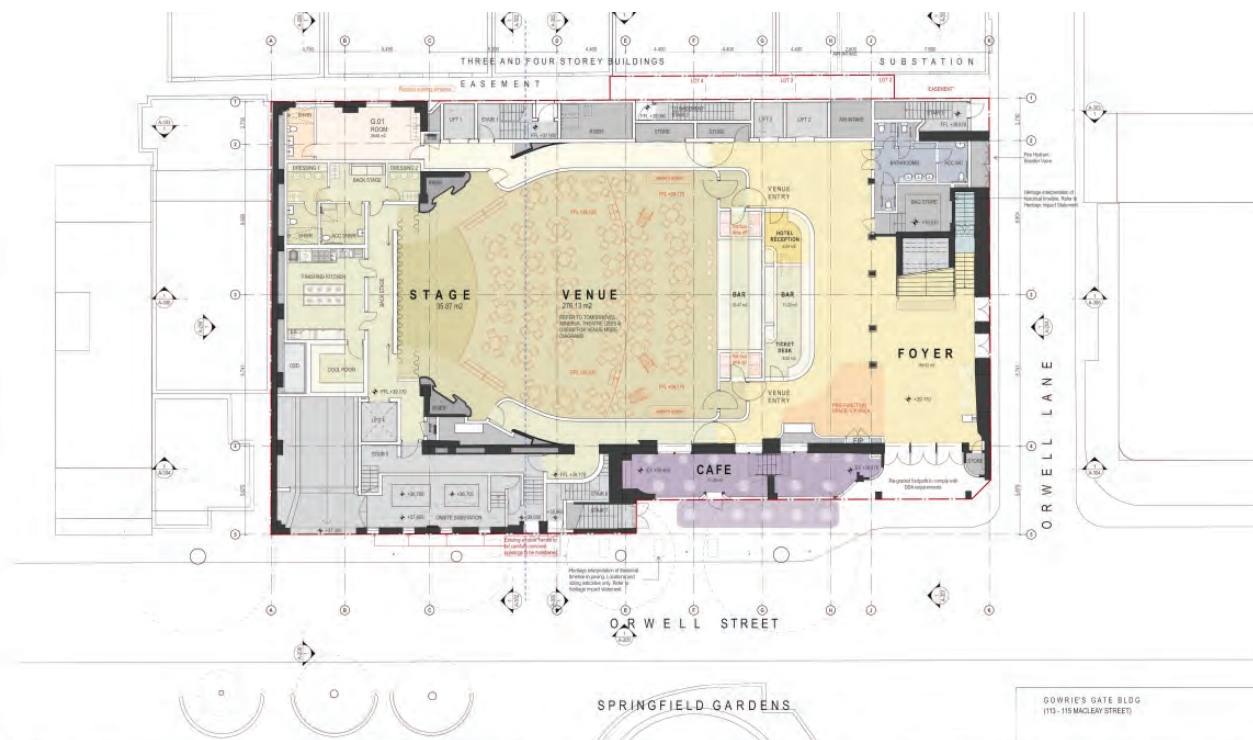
Plan of proposed design by Tonkin Zulaikha Greer Architects.
